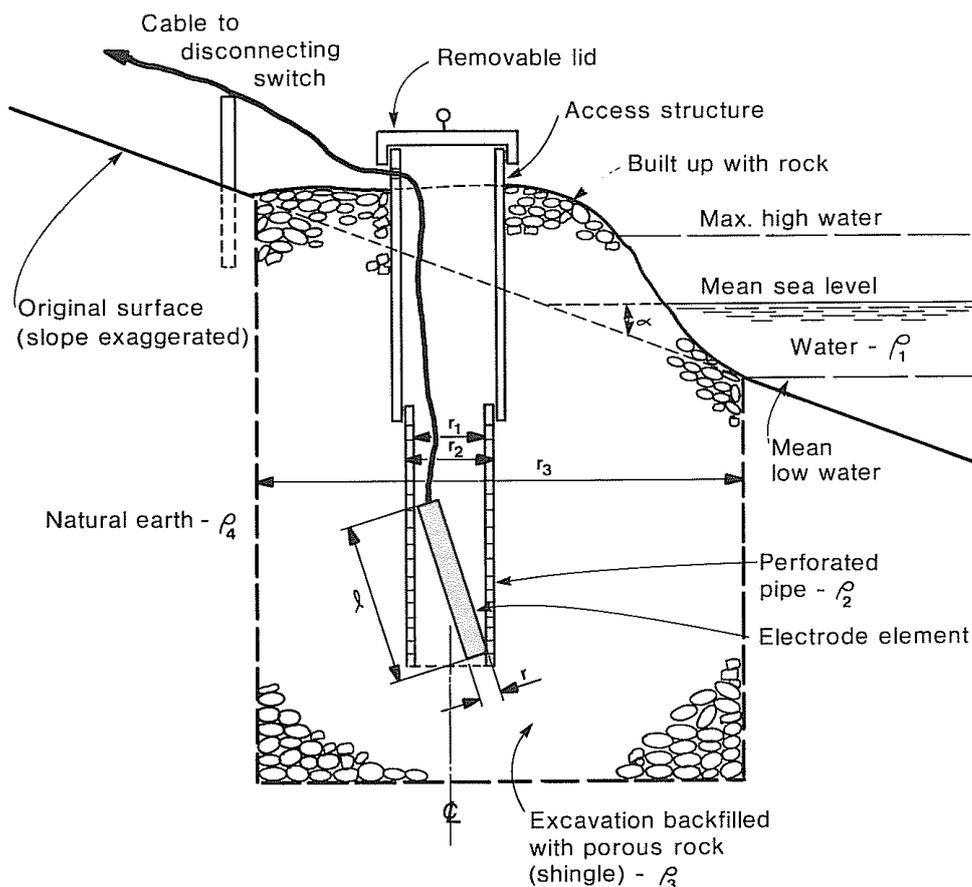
Cross-section of typical beach electrode arrangement [1]
